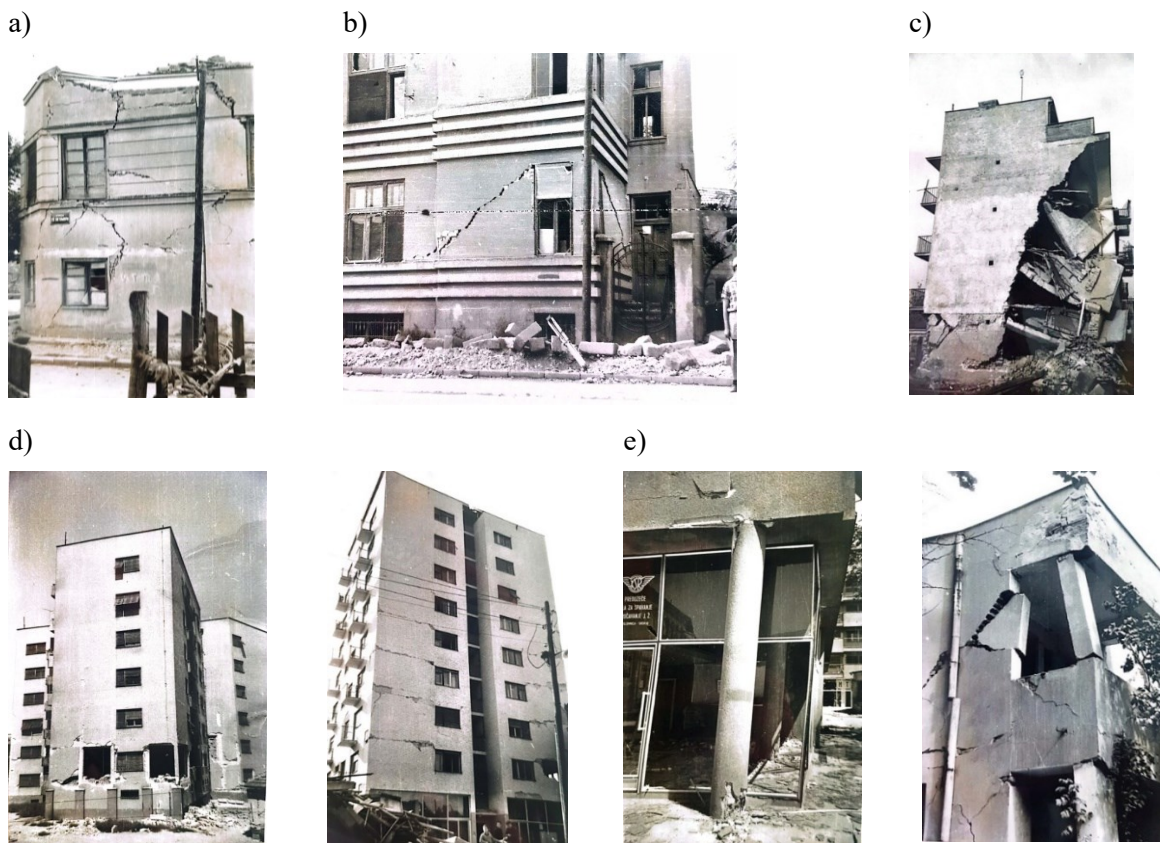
Typical damage during the 1963 Skopje earthquake: a) lack of horizontal/vertical connections, b) diagonal cracks in masonry at ground level; c) collapse of corners and walls due to lack of horizontal/vertical connections; d) separation of walls from the floor structure and partial damage to columns and beams, e) damage to columns due to low stiffness, sparsely placed stirrups and poor horizontal/vertical connections [1].
